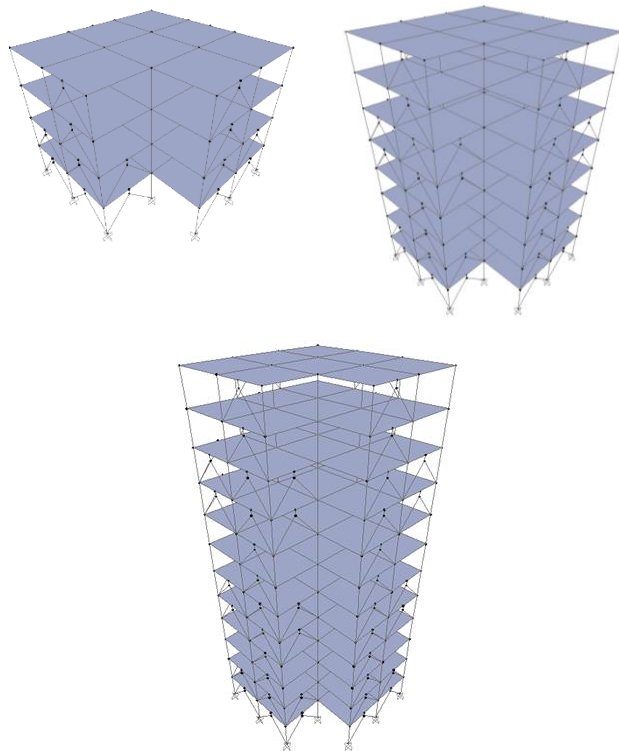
Elevation view of the second bracing configuration of V-EBF with a single vertical link in the four-, eight-, and twelve-story buildings.
